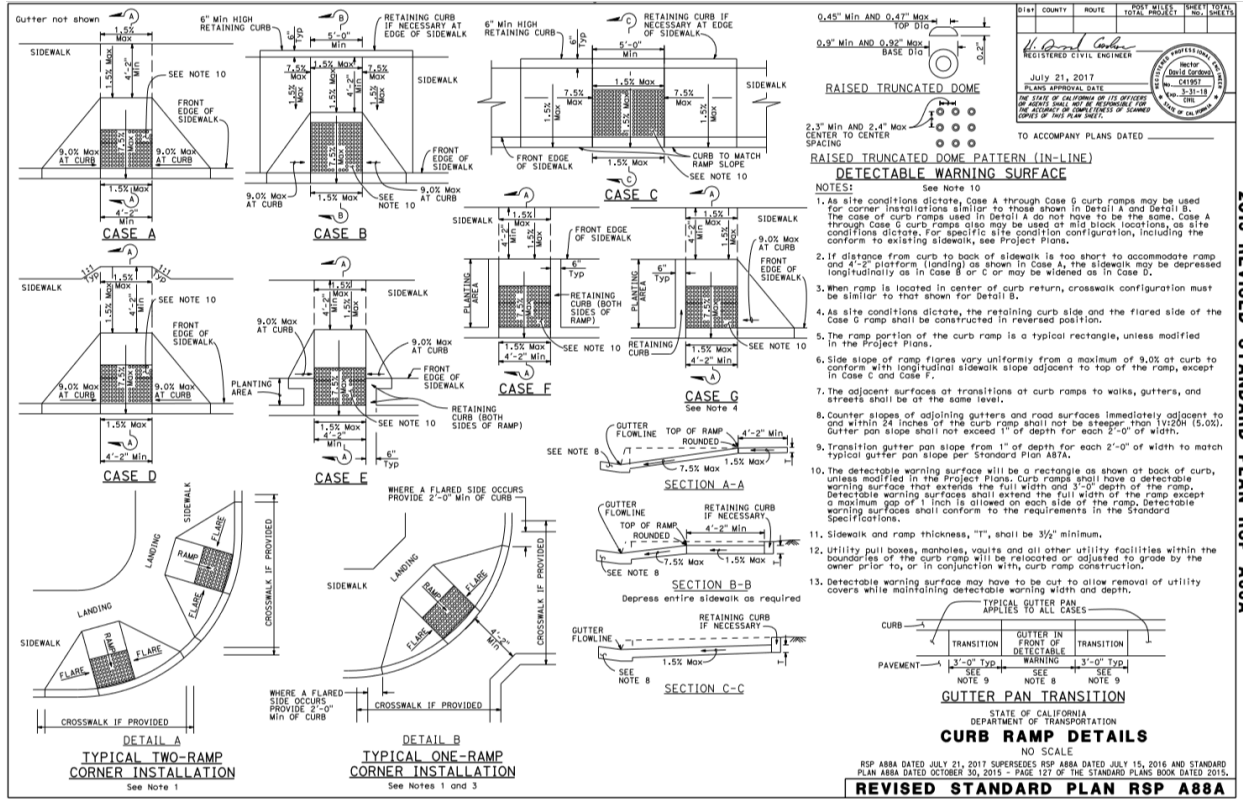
Caltrans Revised Standard Plans for Curb Ramps
